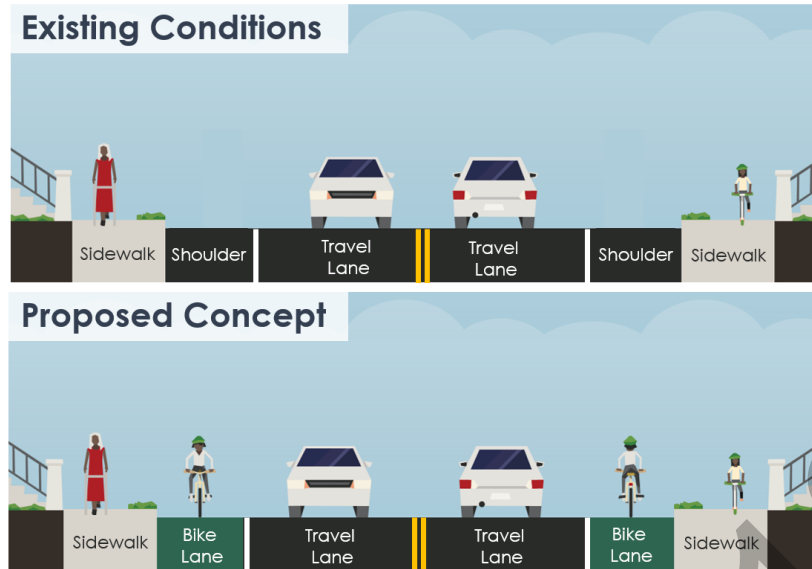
Shoulders to Bike Lanes on Courthouse Road
